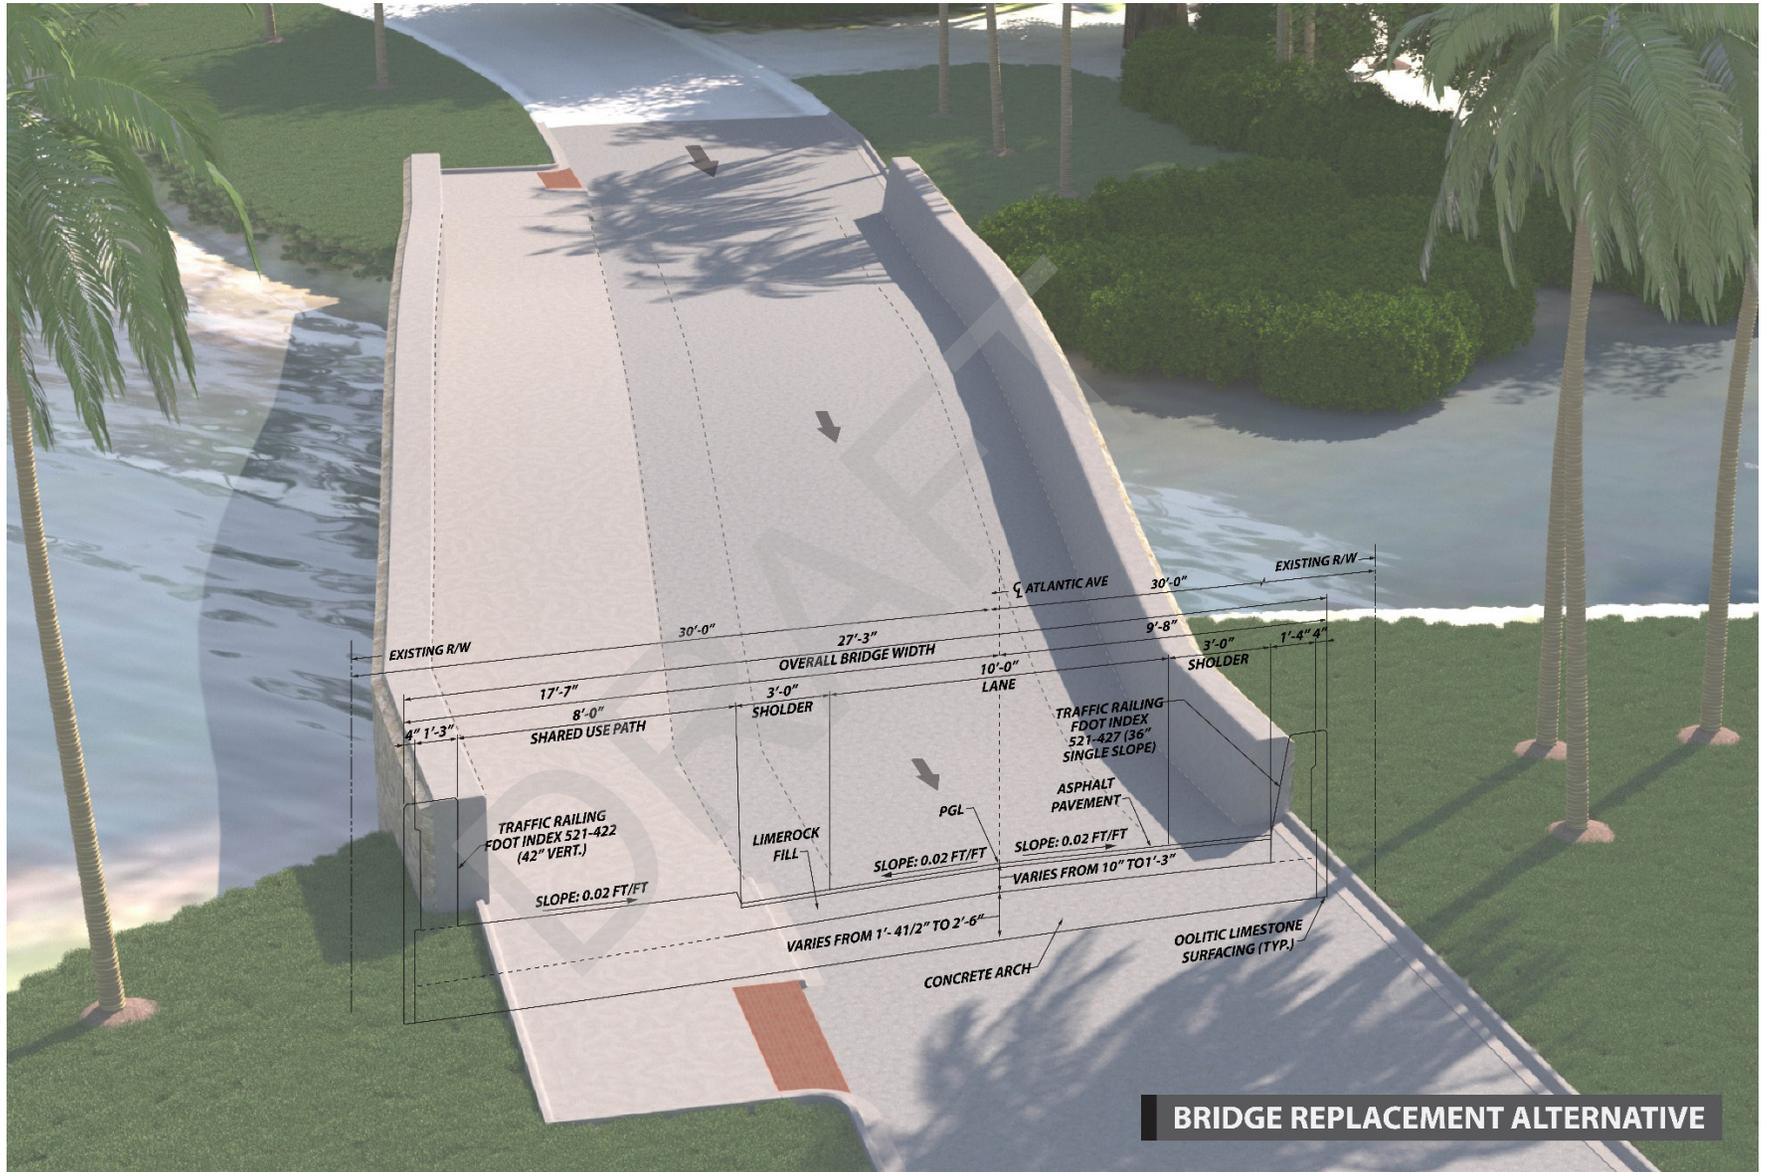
Replacement Alternative (Build Alternative #2) Typical Section
